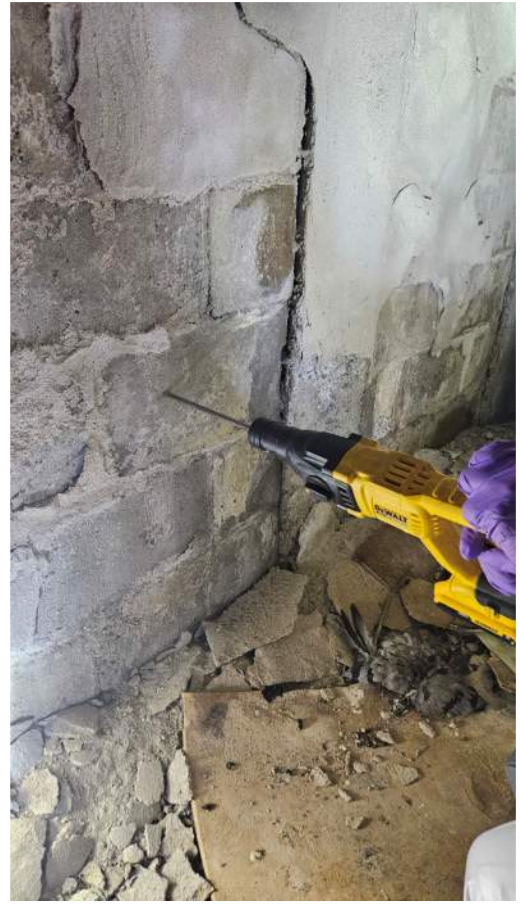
Item S3 – Drilling the hollow CMU Wall of Shop Wing.
